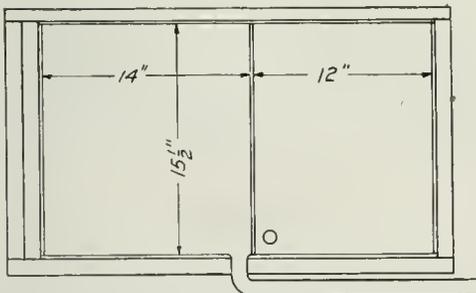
Top View of Hypo and Wash Tanks, Dark Room No. 2
